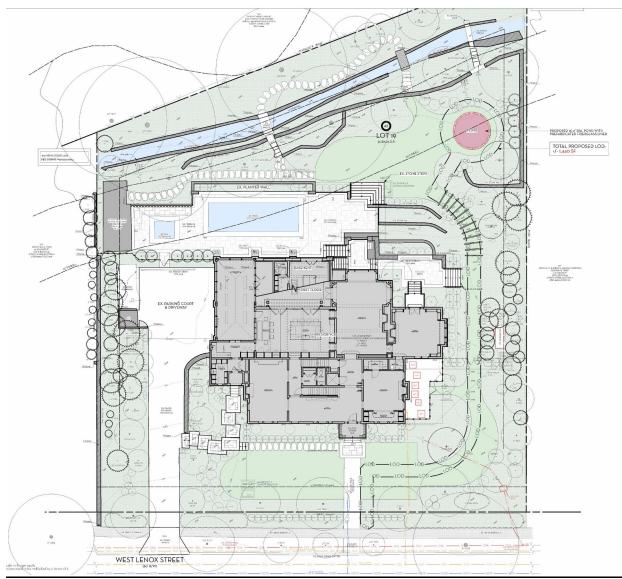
The site plan shows the proposed pond in red in the property's northeast corner.
